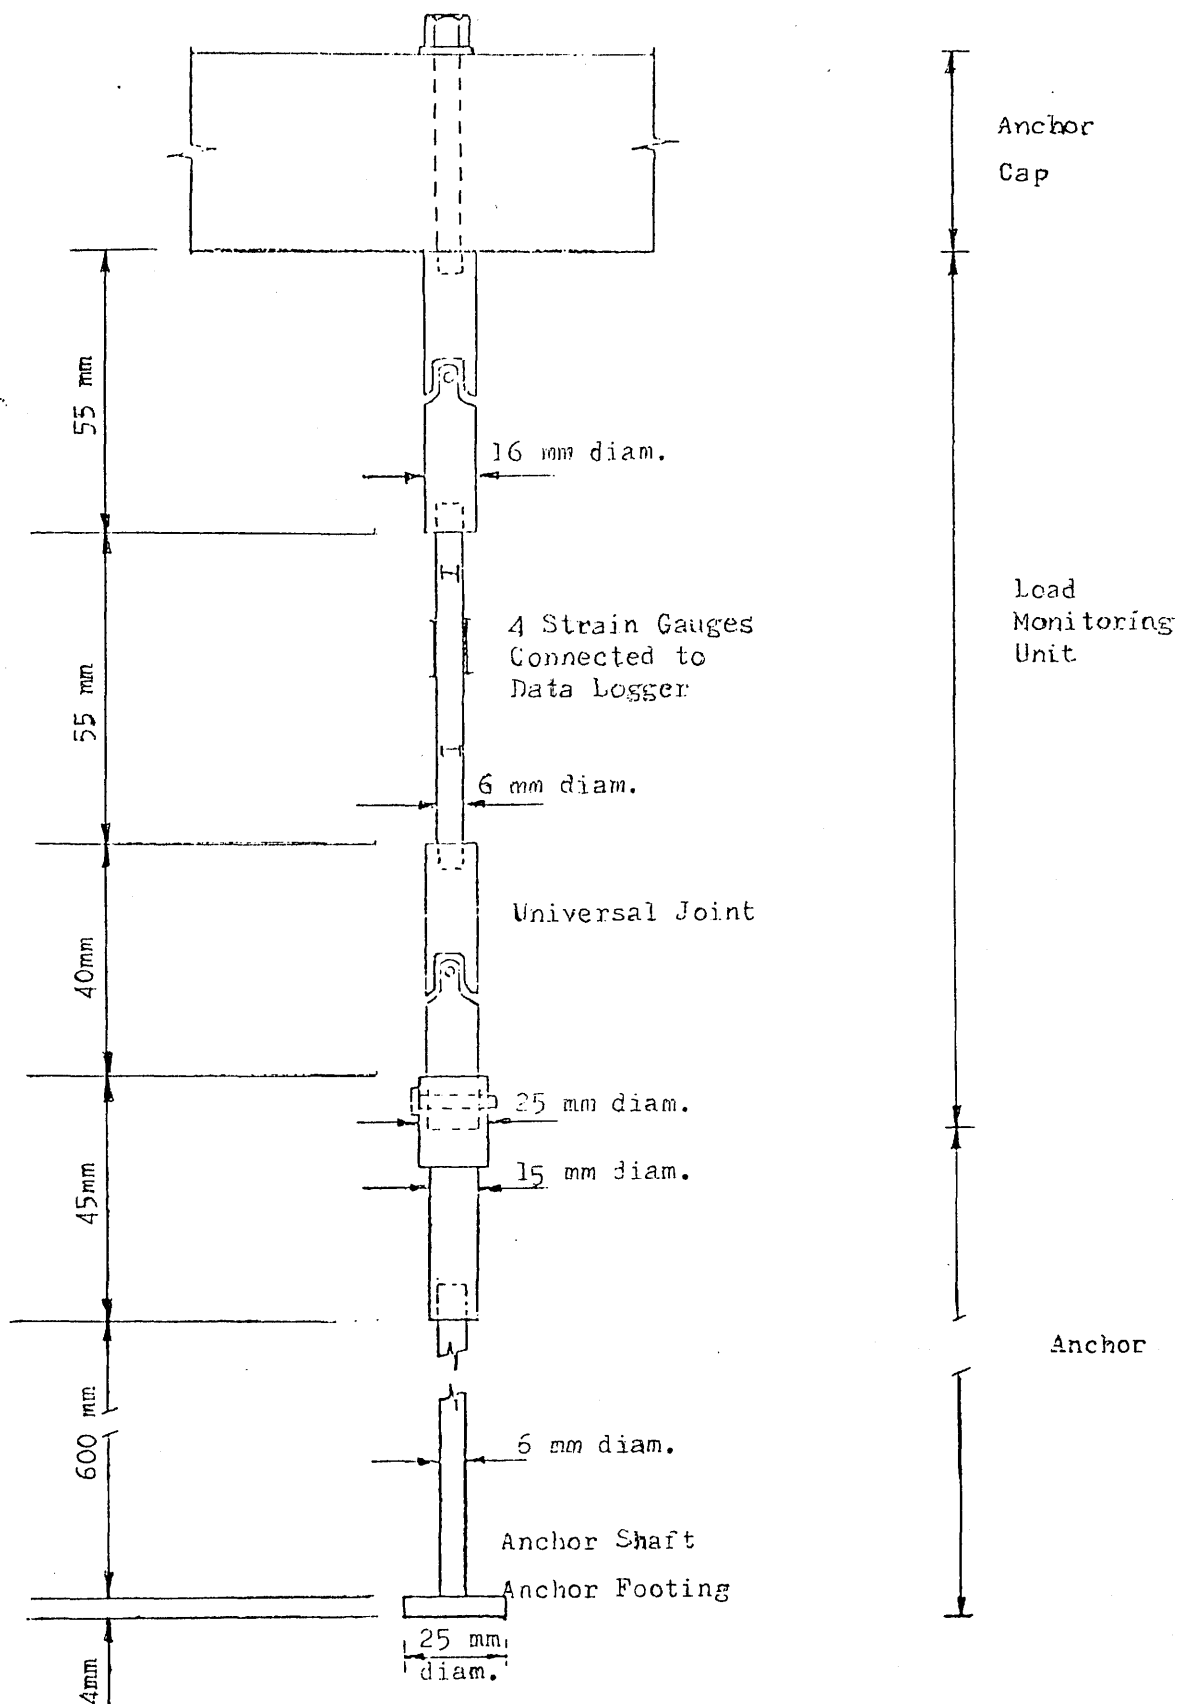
DETAILS OF AN ANCHOR UNIT.
